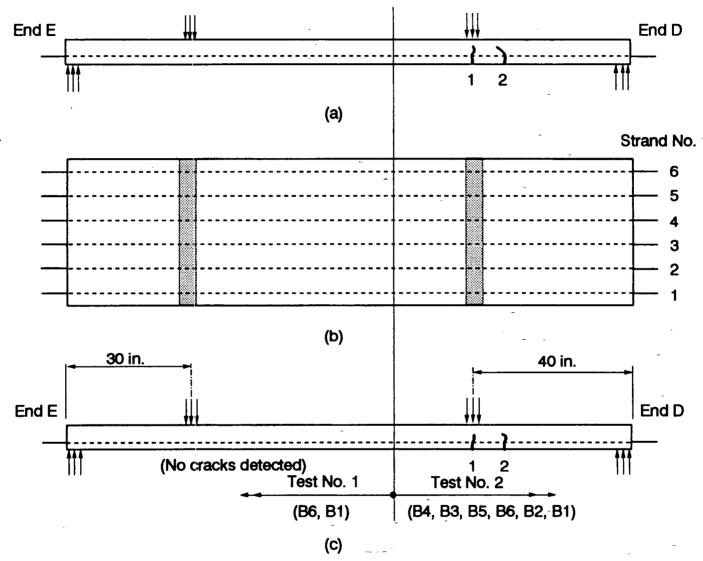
Crack pattern for D-type Specimen No. 6-6.0DU-3:
